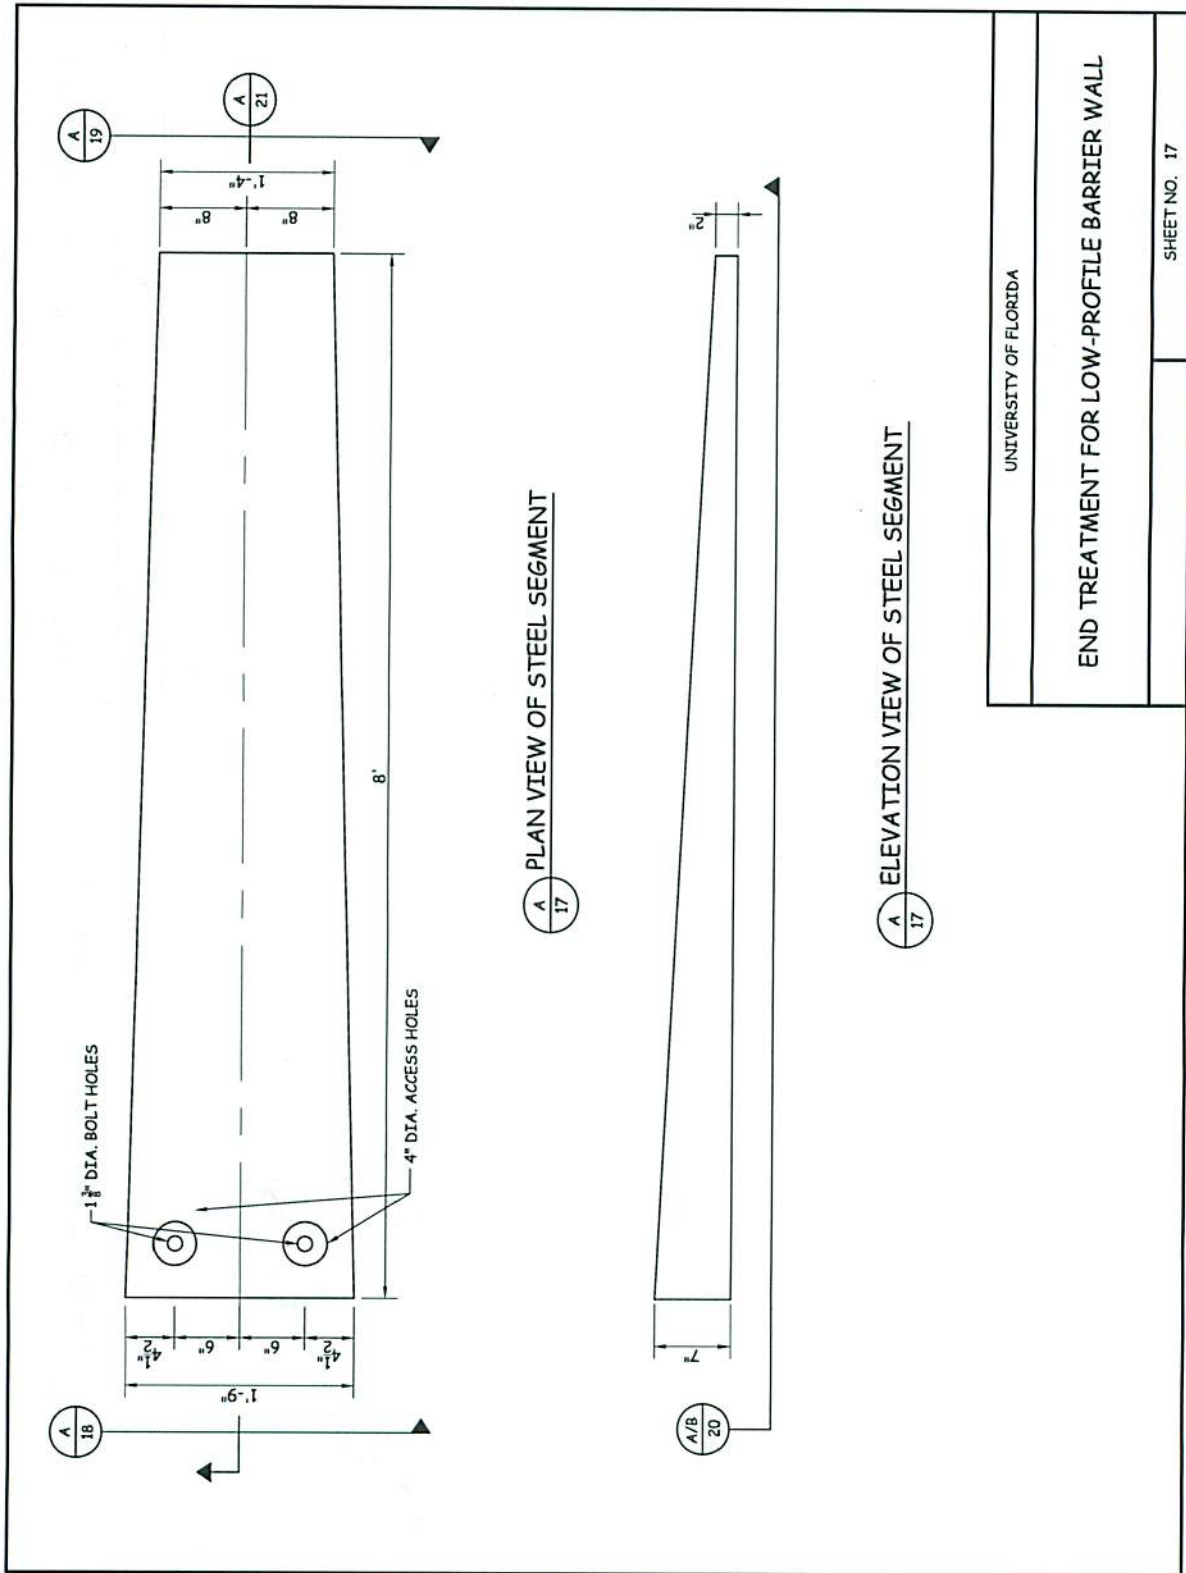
Drawings of Florida Concrete Curb End Treatment (9 of 14)
